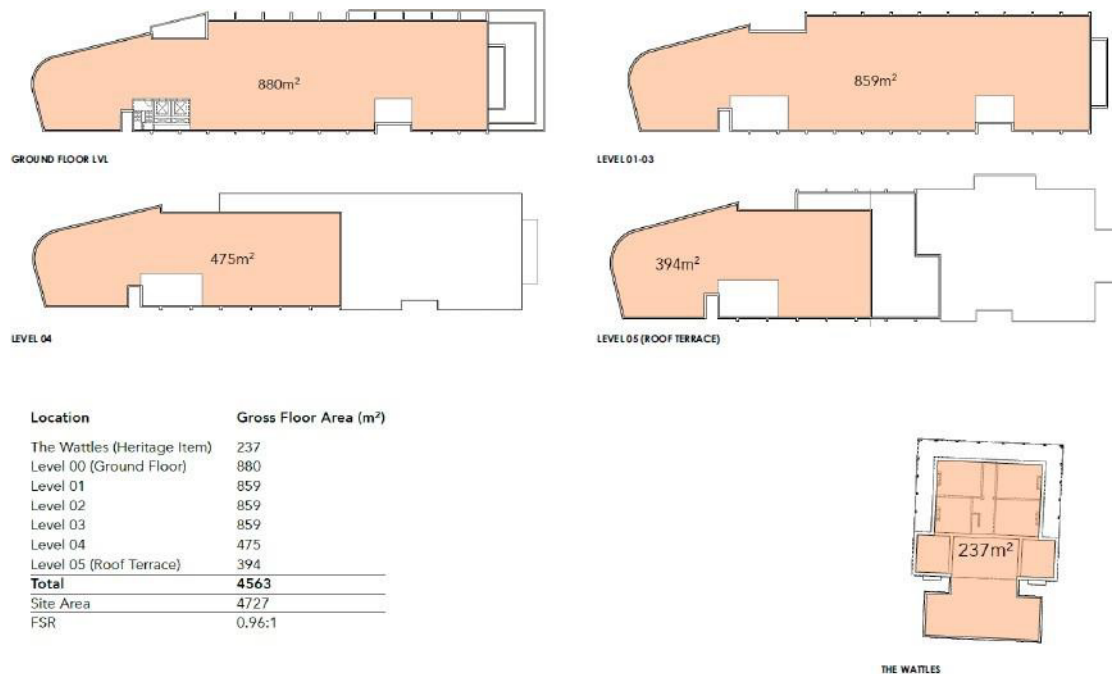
Proposed amended floor plans (adopted from Olsson Architects)
